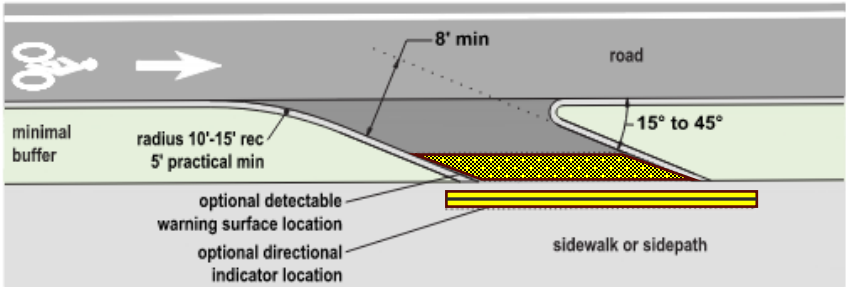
Typical Layout of Bike Lane Transitions to Shared Use Path at Multilane Roundabout with Bike Ramps
